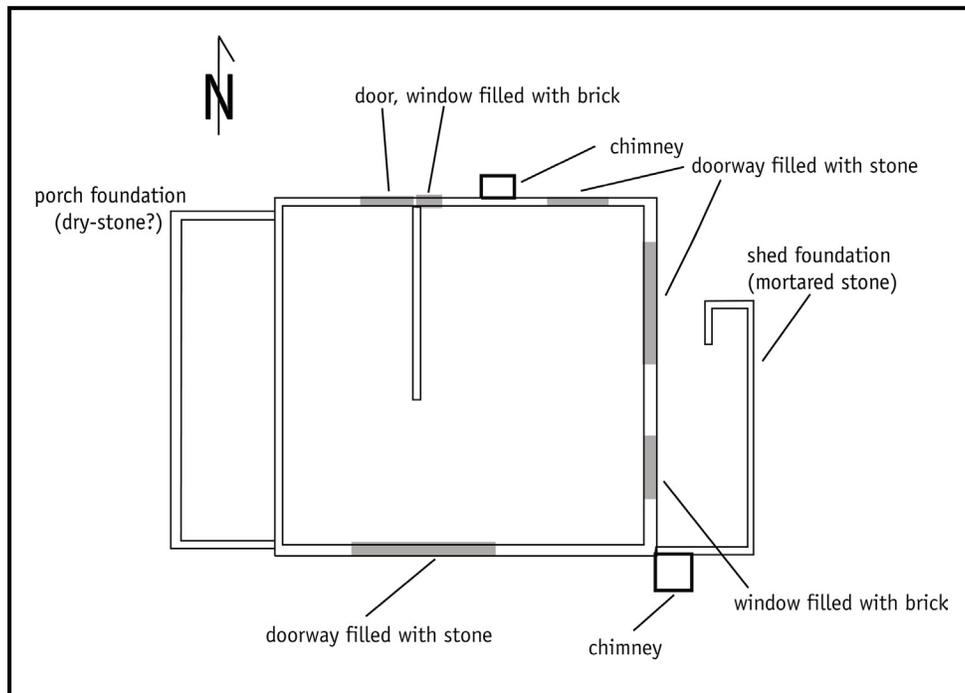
Sketch plan of ground floor masonry wall and foundation remains at Site 44AB342.
